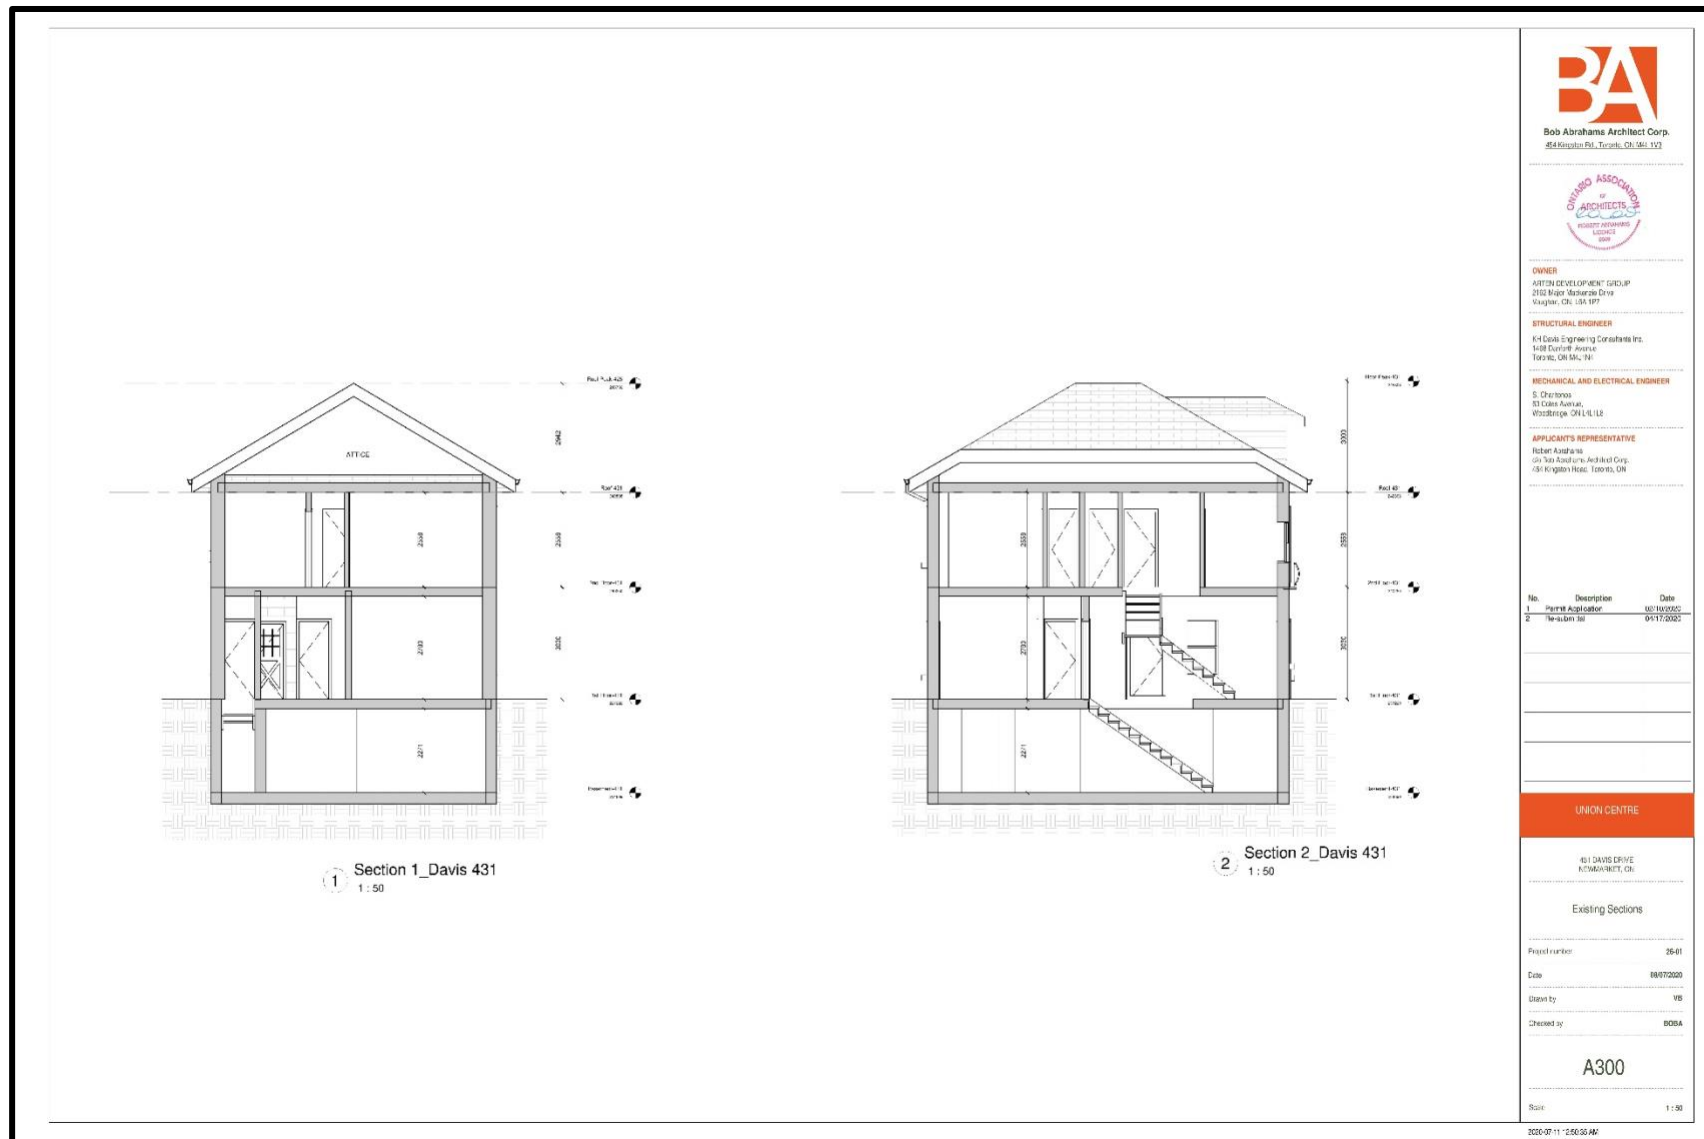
Existing Cross Section Layout for 431 Davis Drive
